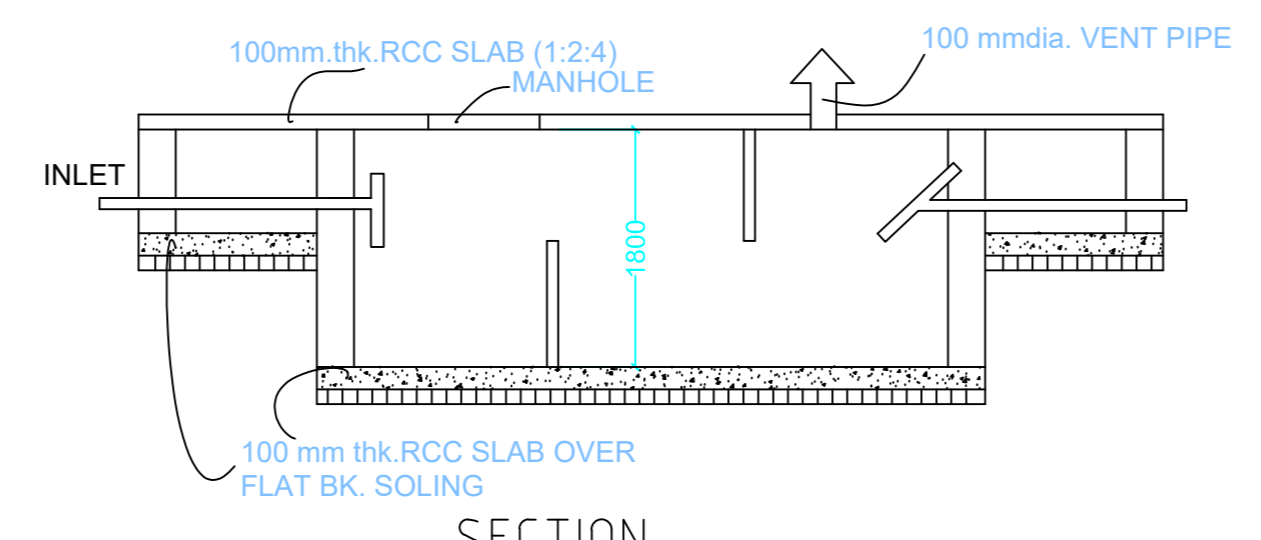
DETAIL OF GROUND WATER RECHARGING PIT WITH SILT TANK SCALE - N.T.S.
